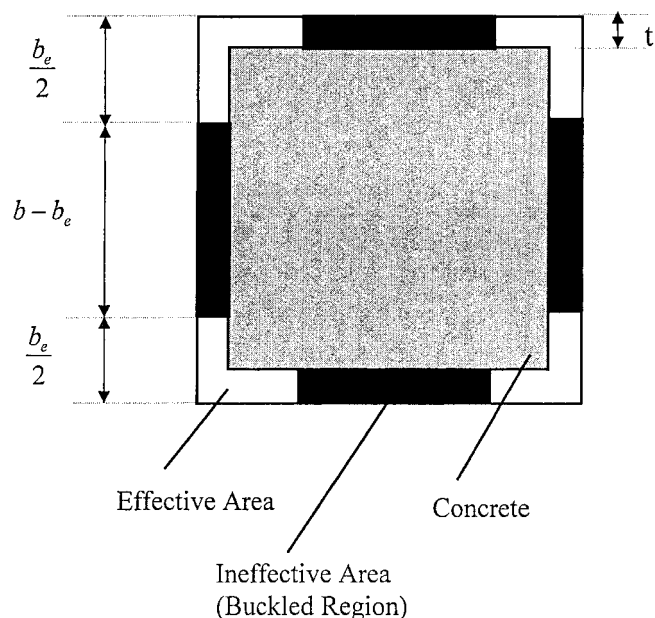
Effective Width of Concrete Filled Steel Box Column
